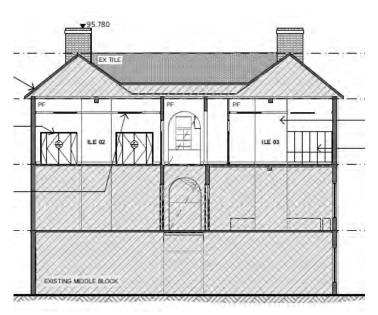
Proposed north-south section Elevation. (Source: SHAC Architects)
